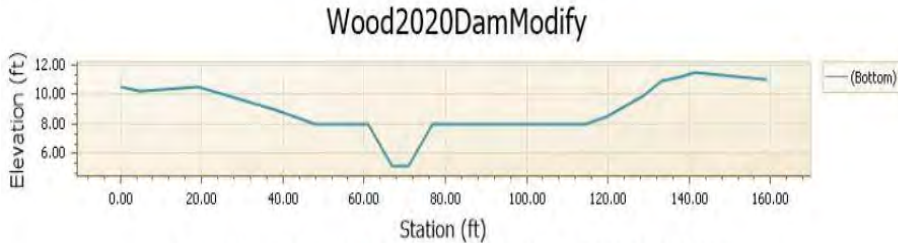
Proposed Alternative 2 Dam Modification Cross Section
